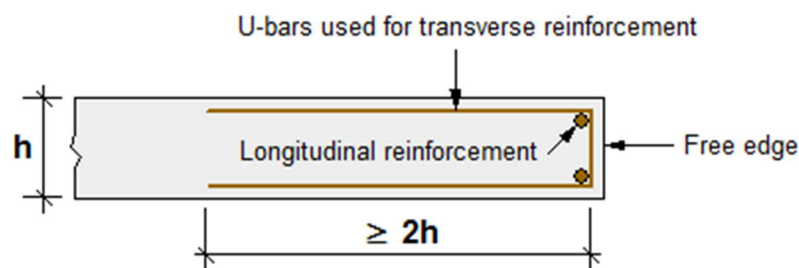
Free edge reinforcement of a slab (The Concrete Centre, 2017)
